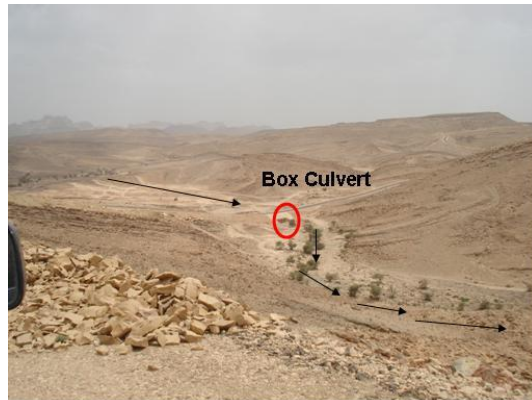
Top view showing location of the crossing structure at the intersection of Wadi Khulaga main floodway and a highway
